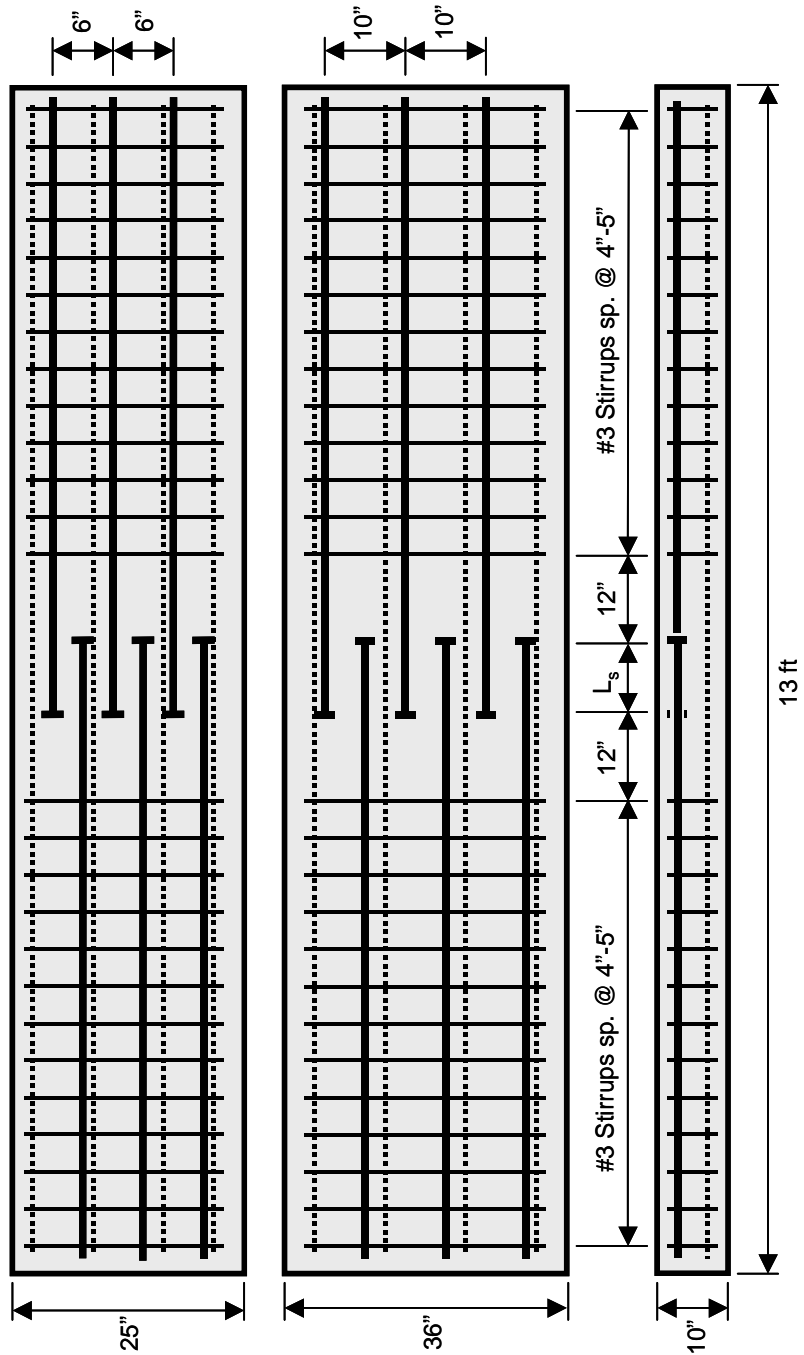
(a) – Reinforcement Layout for Staggered Specimens w/ #8 Bars
